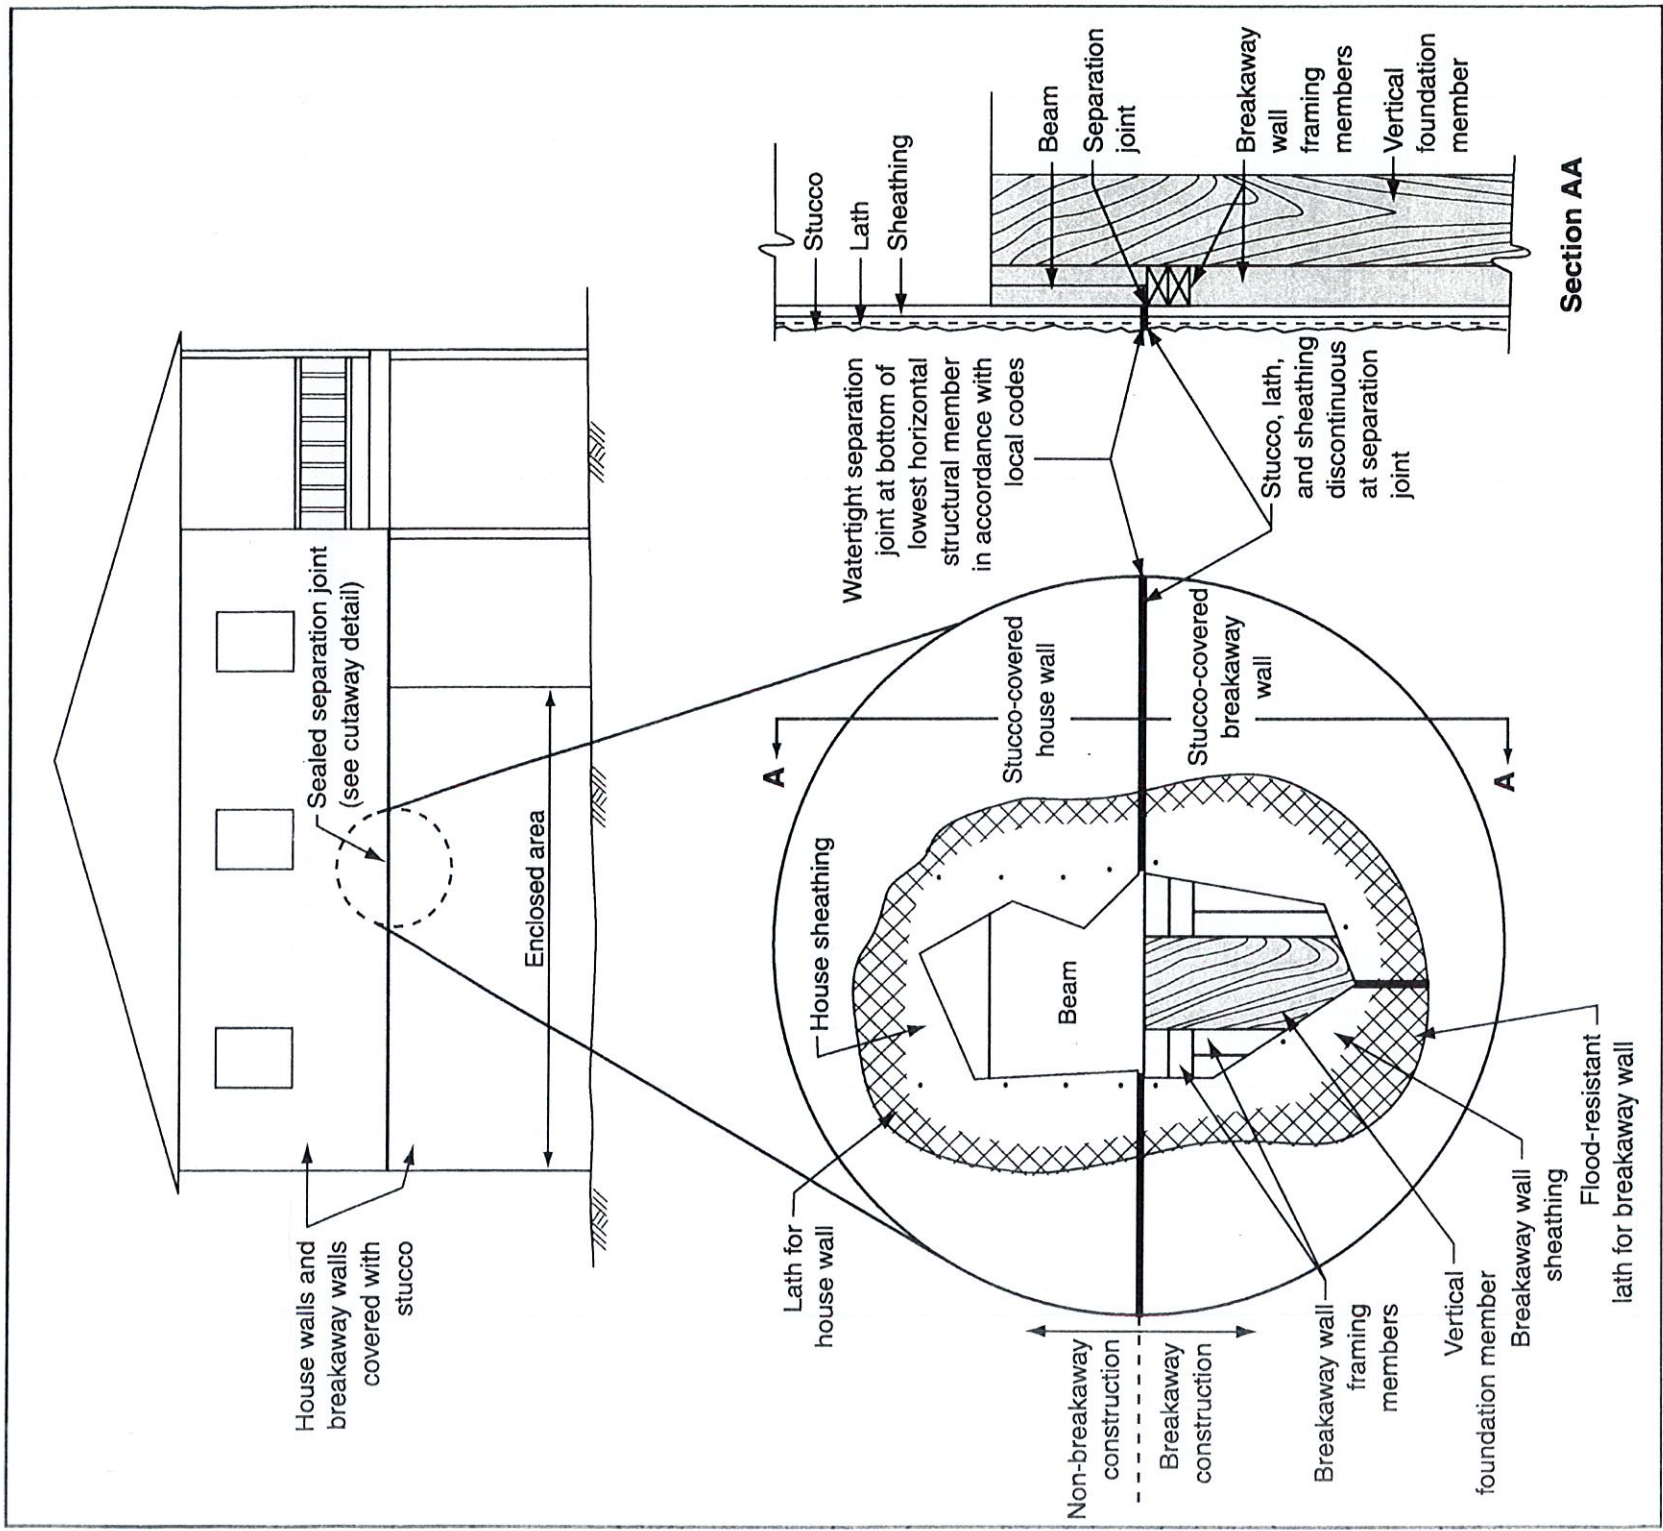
Separation joint between sheathing and wall covering (e.g., stucco, siding) on house walls and breakaway walls
